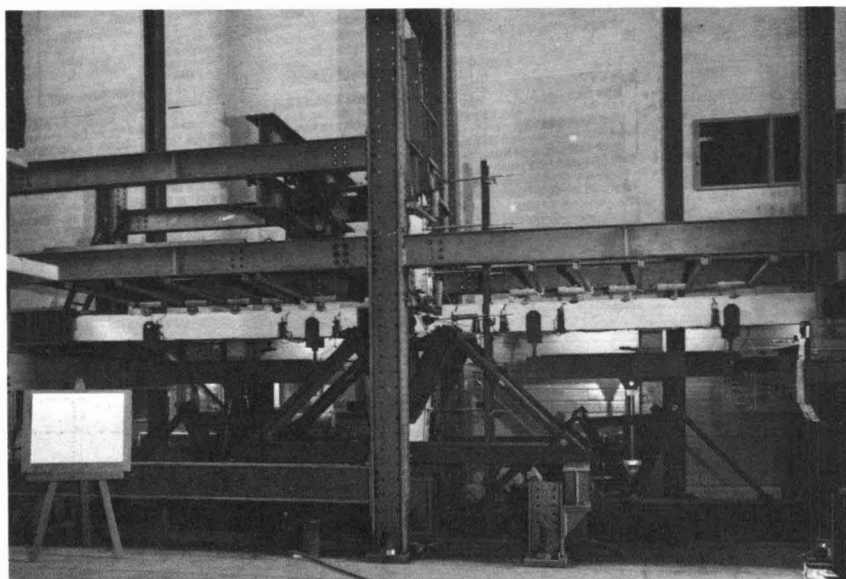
OVERALL VIEW OF TEST SETUP FOR TEST SPECIMEN RC-2
